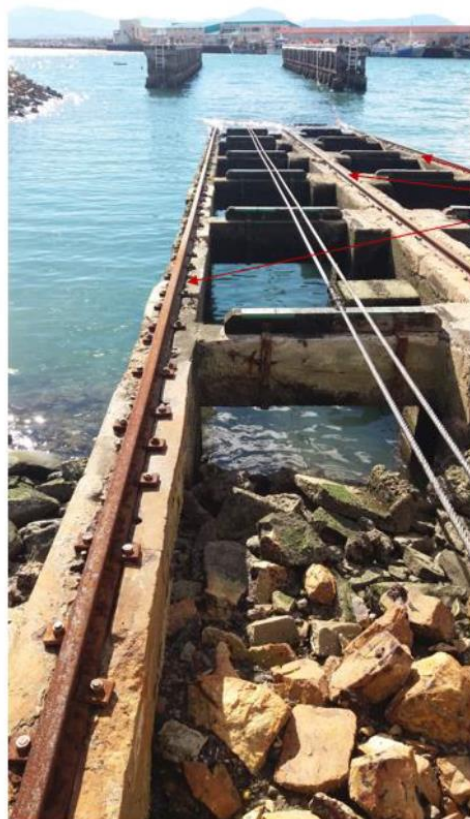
Examples of sever structural cracks in the slipway beams
